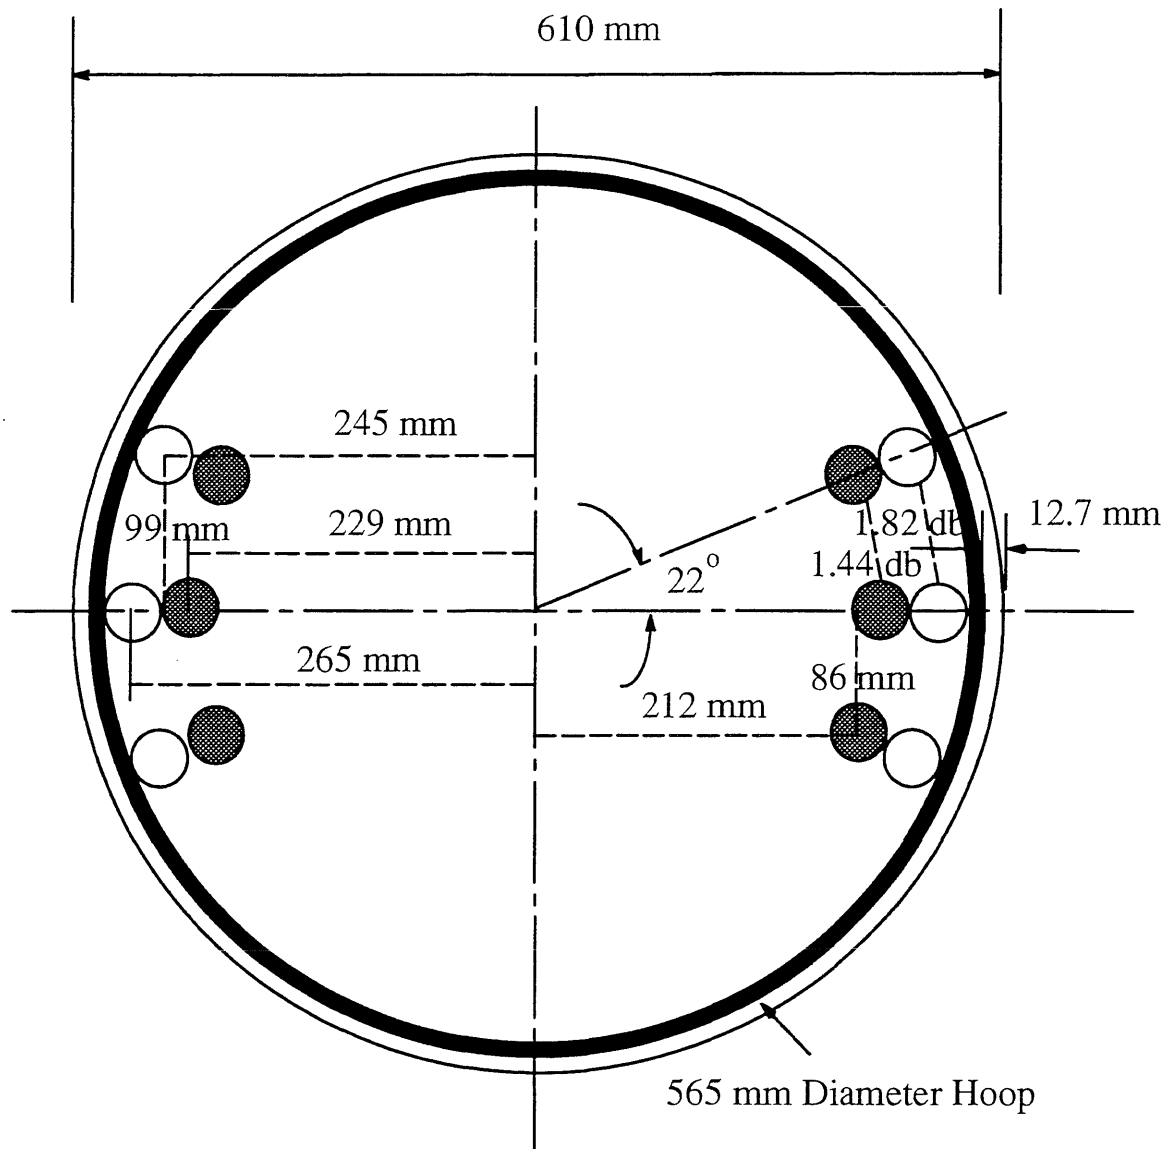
Cross Section for Column A-1 (L=0, C=12.7 mm)
